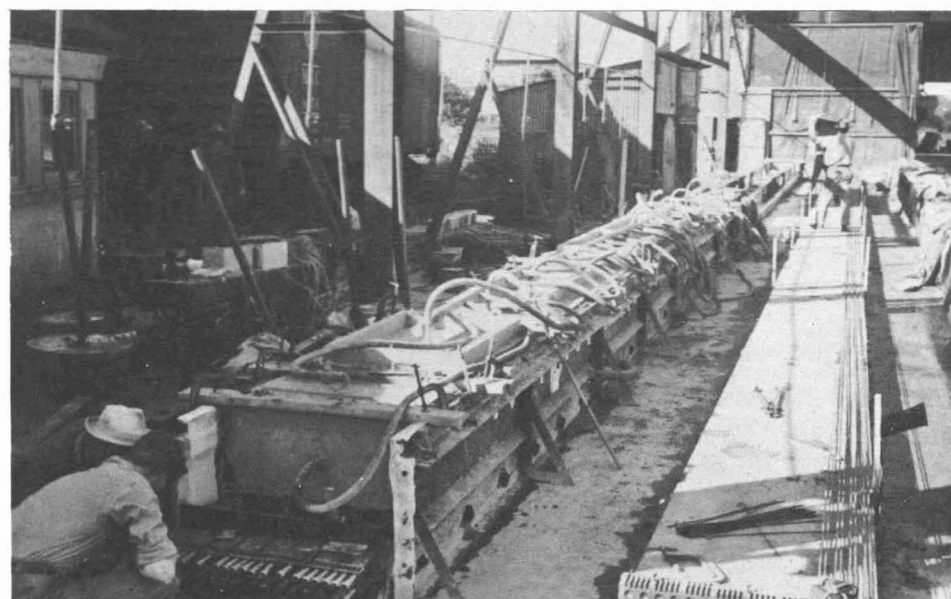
VACUUM TREATMENT OF TEST BEAM
